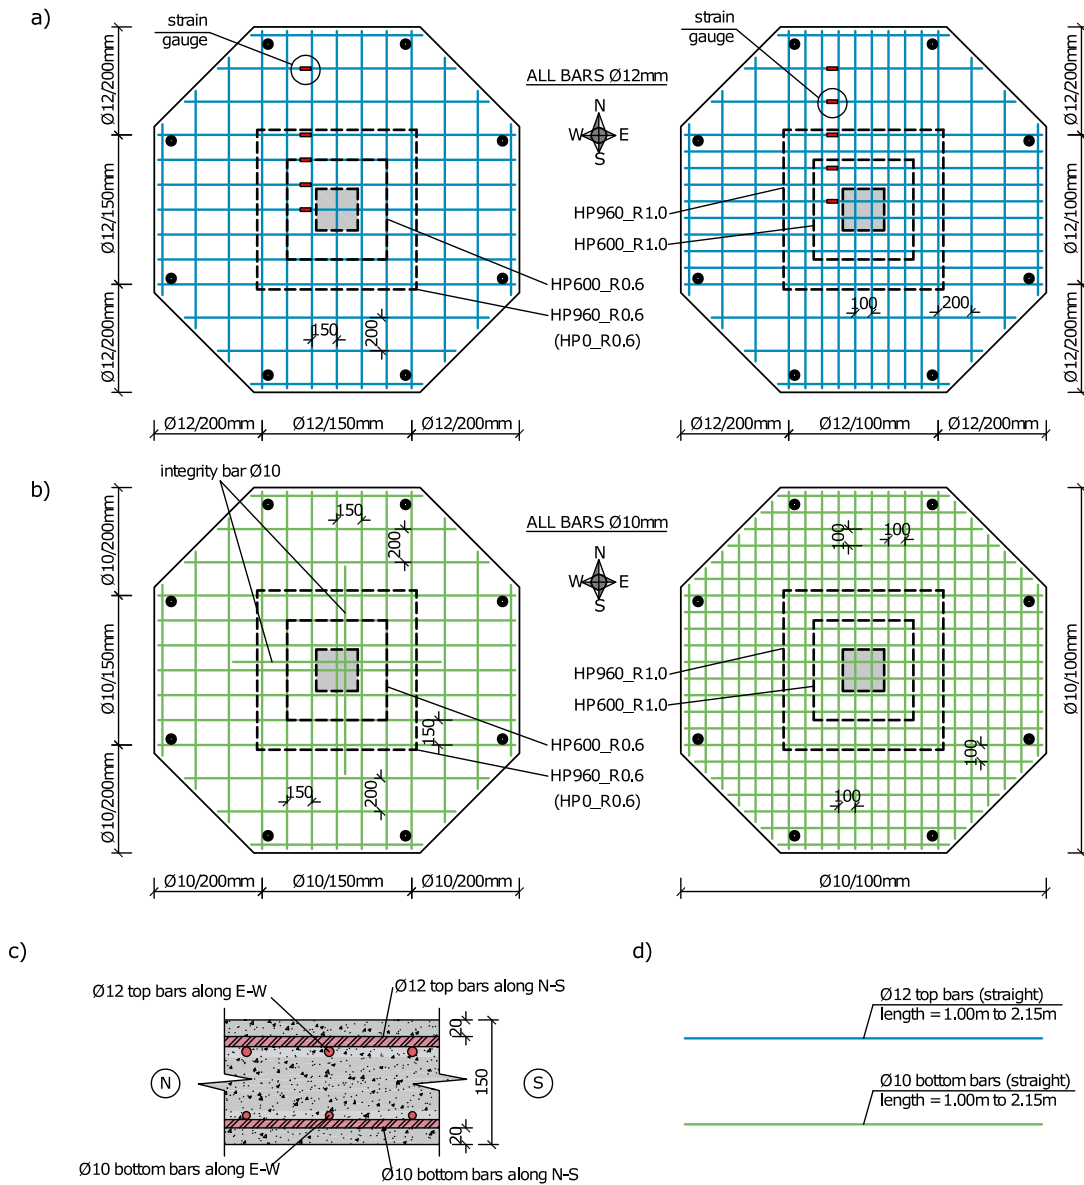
Flexural reinforcement and strain gauges: a) top rebar; b) bottom rebar; c) cross-section detail; d) reinforcement detail.
